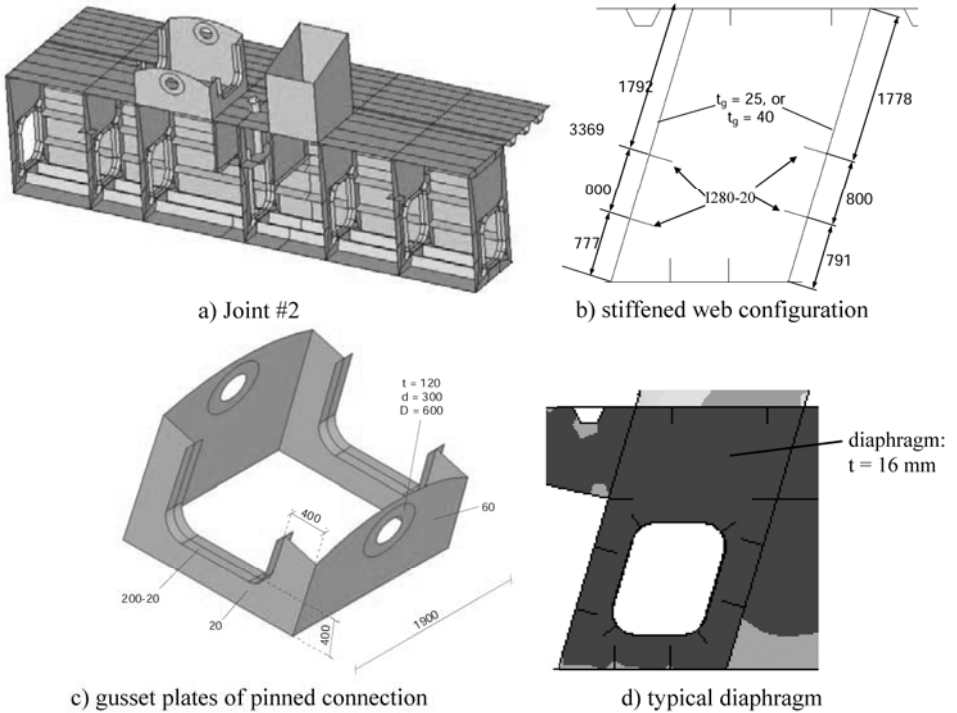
Plate elements in stiffening beam and supporting bar Joint #2.
